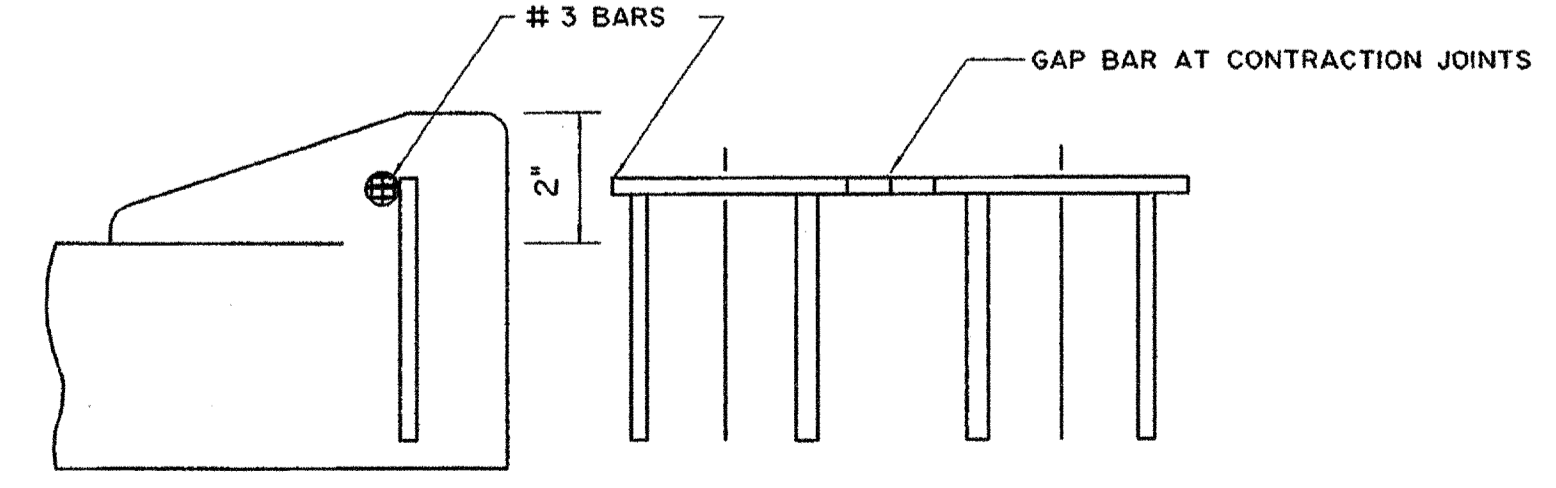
DETAIL SHOWING JOINTS IN CONCRETE CURB AND GUTTER
